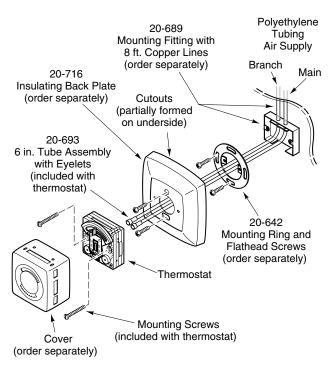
Surface Mounting of Thermostat, Pipehead Application.
